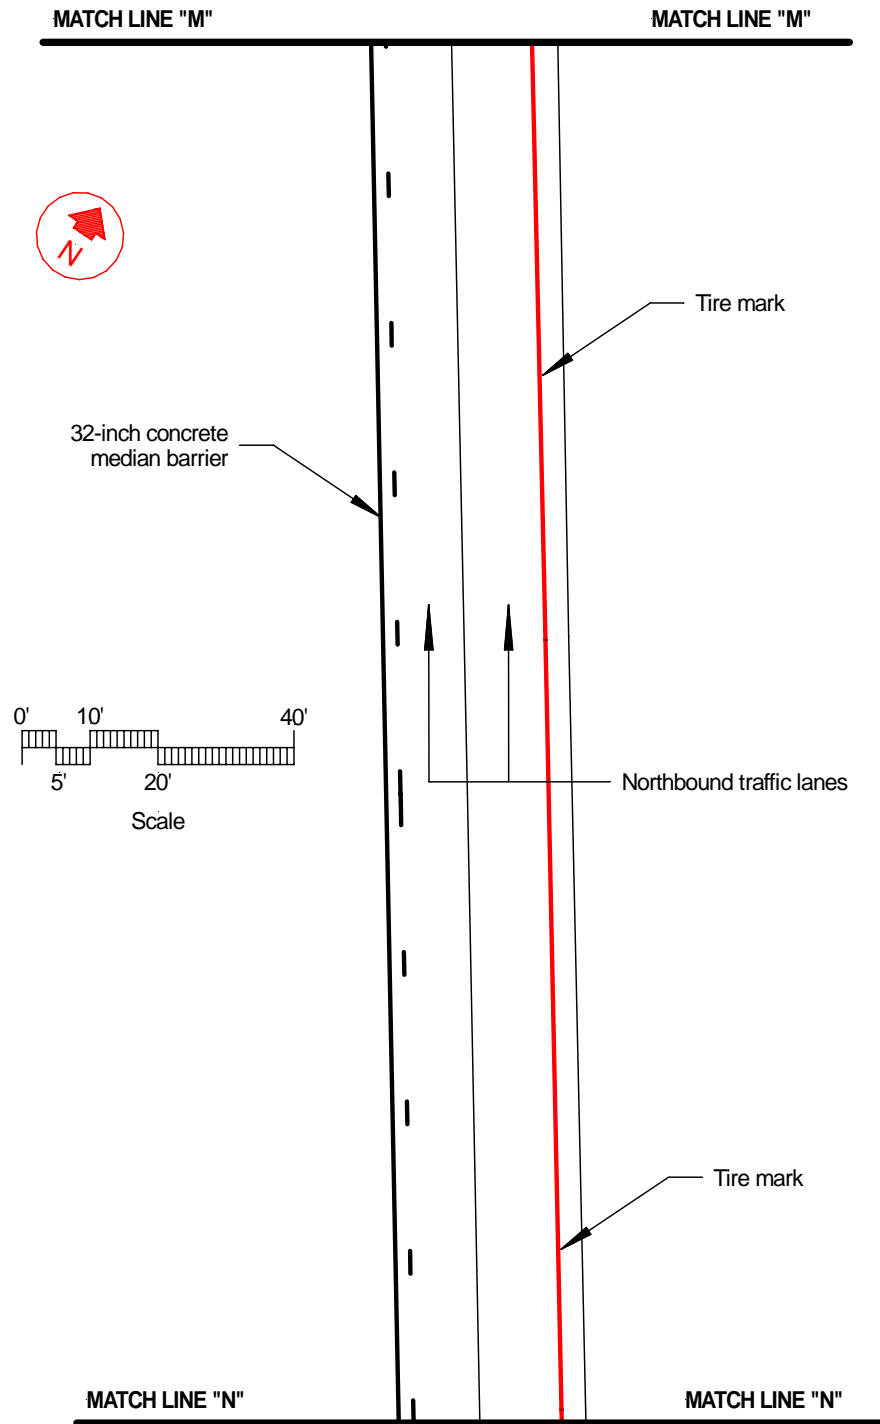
NTSB map of M-N pavement markings and roadway evidence.
